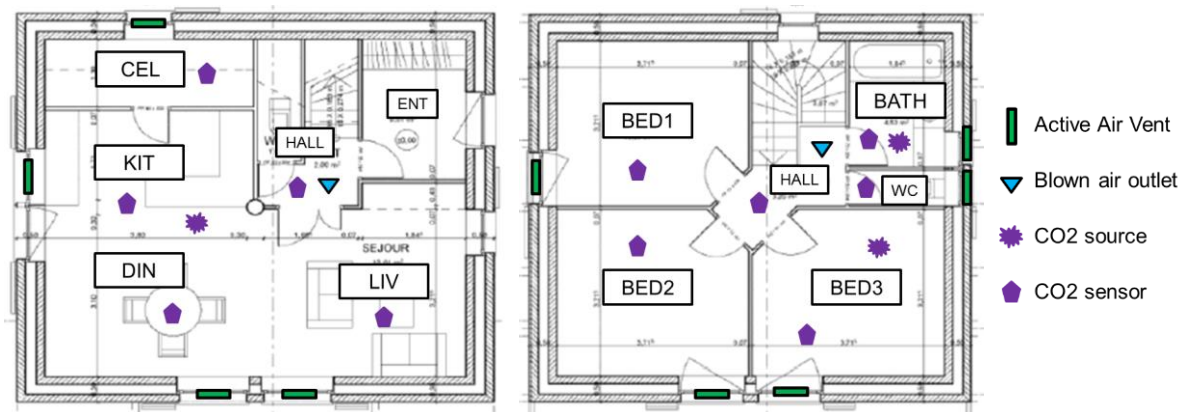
Introduction of the experimental house – Left: Plan of the first floor. Right: Plan of the second floor.
